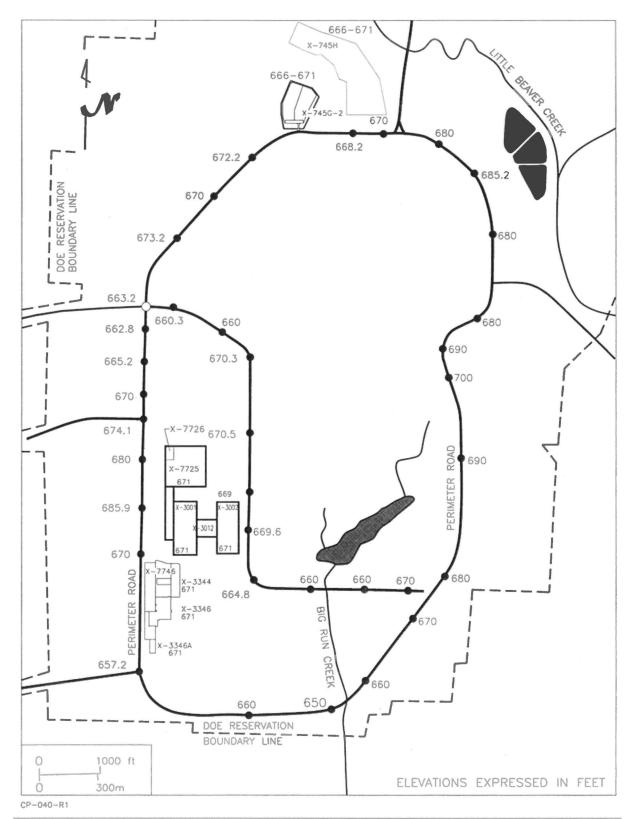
Elevations of Roadways and of the Surrounding Areas of Main Process Buildings
